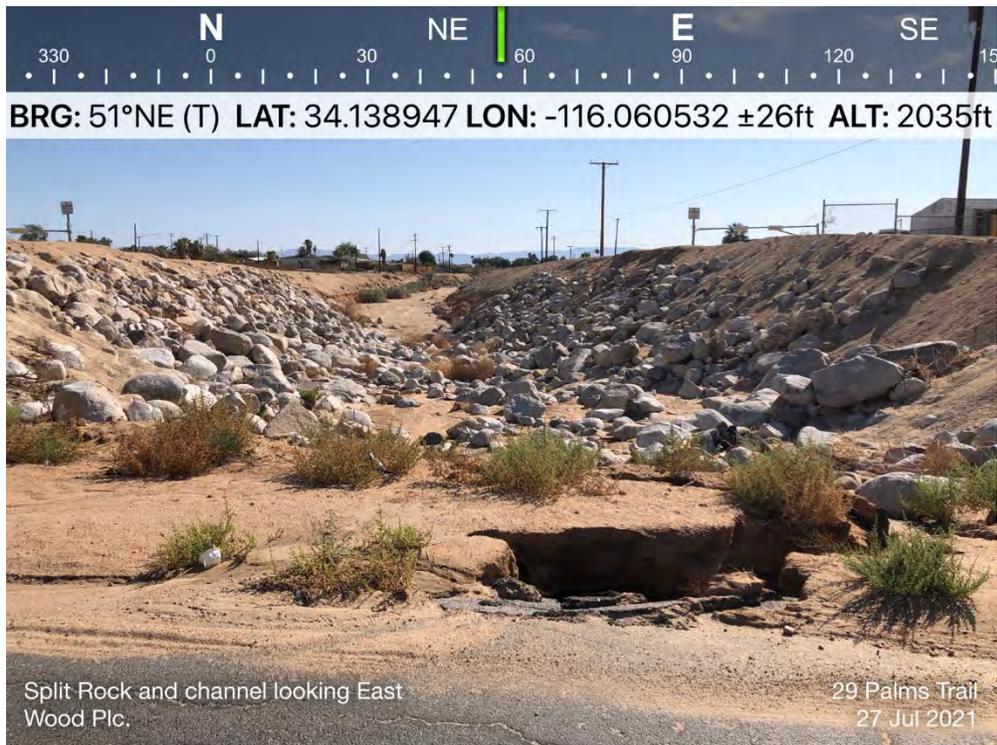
View of unnamed drainage looking east (downstream) from Split Rock Avenue.
